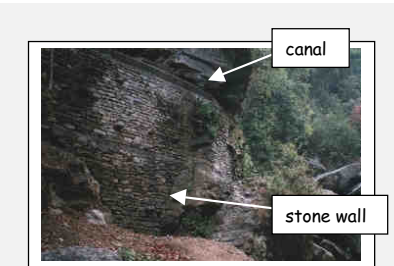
and Figure 10-10 show a raised canal that runs on a narrow ledge underneath a vertical rock face. The canal has a masonry lining and is supported by a high stone wall underneath.
